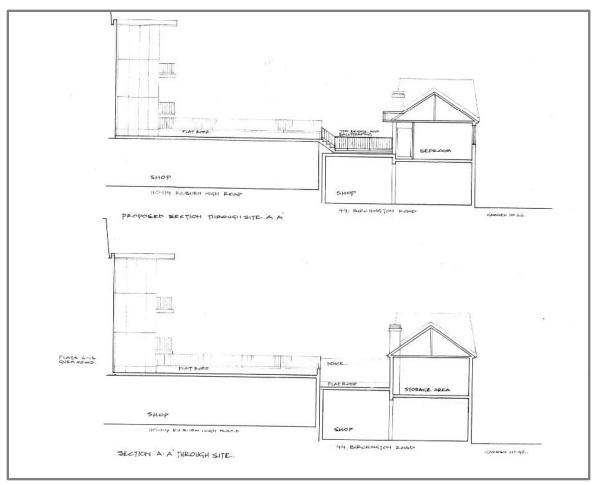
Excerpt of approved sections (existing bottom & proposed top) showing access and balustrade railings on the roof at first floor level
